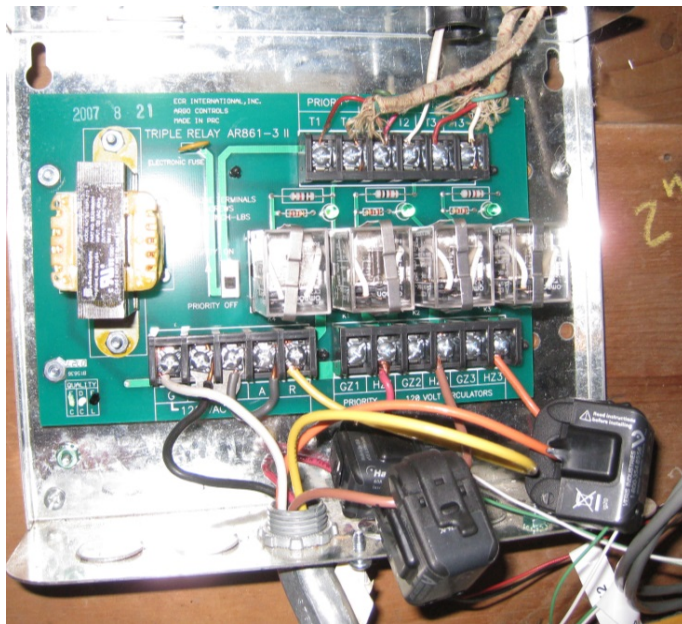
Boiler control board showing current switches measuring boiler zone statuses
